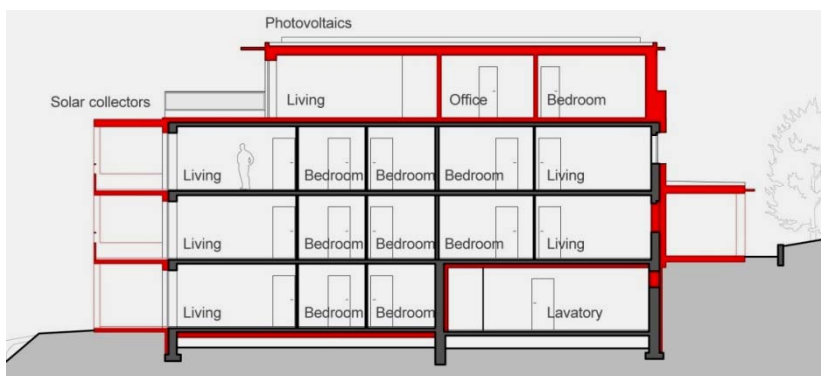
Vertical section of building. New parts in red (new balconies to the South, additional penthouse apartment, building annex for new heating system)
